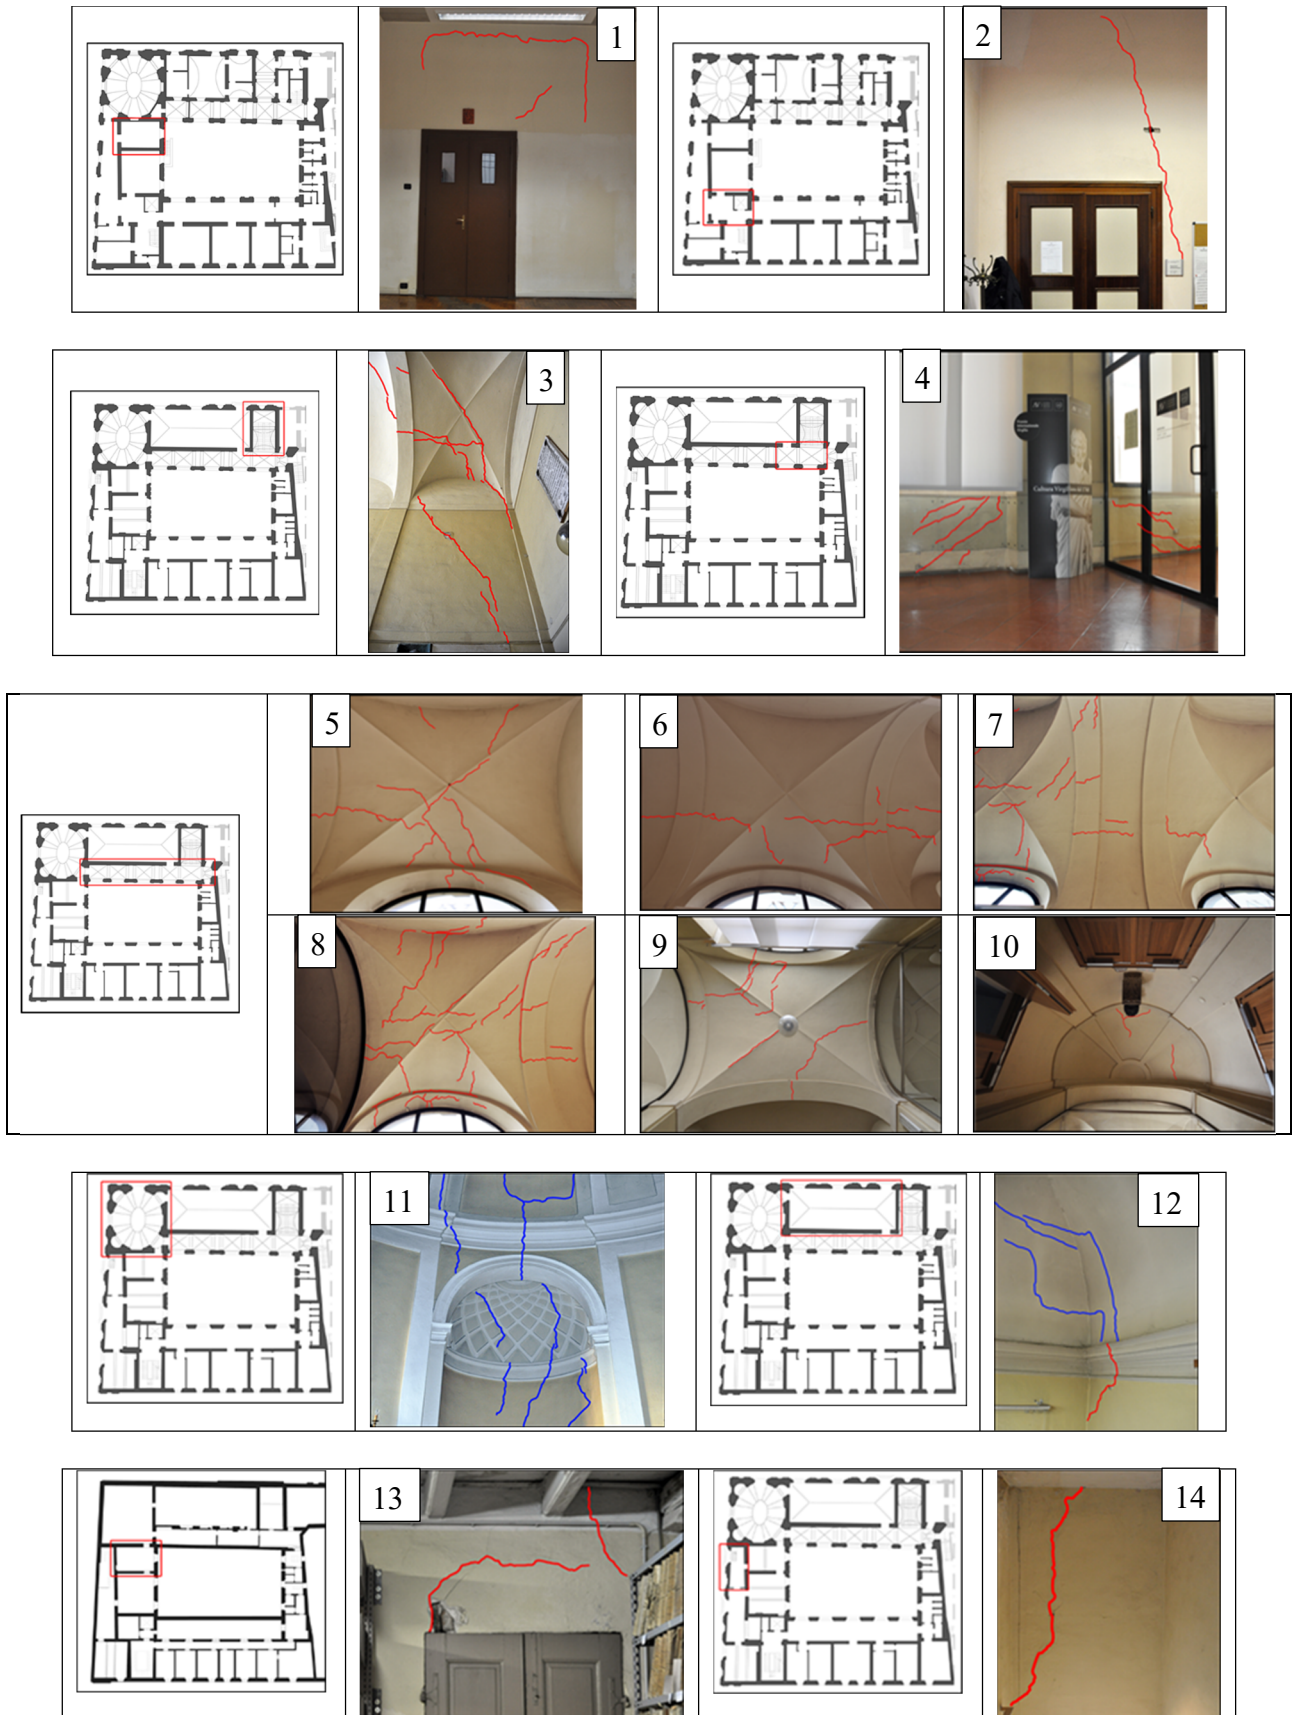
Palazzo dell'Accademia: photographic documentation of the crack patterns. 1. Wall of the director's office, ground floor. 2. Wall of the hallway, first floor. 3. Vault and wall of the Staircase of Honour, ground floor-first floor. 4. Wall of the corridor/Entrance of Honour, first floor. 5-10. Vaults of the corridor/Entrance of Honour, first floor. 11. Vaults of the Oval Room, first floor. 12. Vault of the library, first floor. 13. Lintel of the door of the historical archive, second floor. 14. Wall of the stair, first and second floor.
